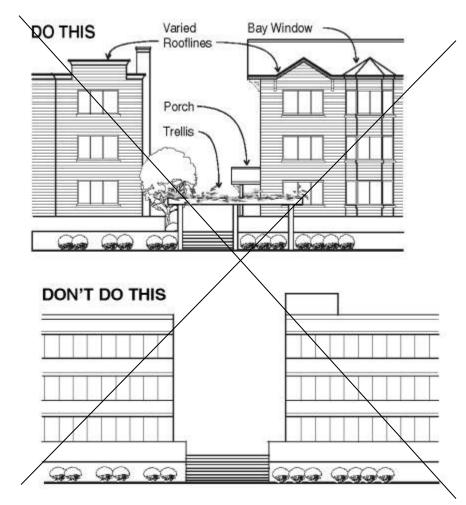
(A): These two projects point out the importance of architectural elements. They are essentially the same building envelope except that the upper example employs varied roof lines, window details, facade articulation, a trellis, chimneys, entry details and other features that reduce the "visual bulk" impact of the facade.
